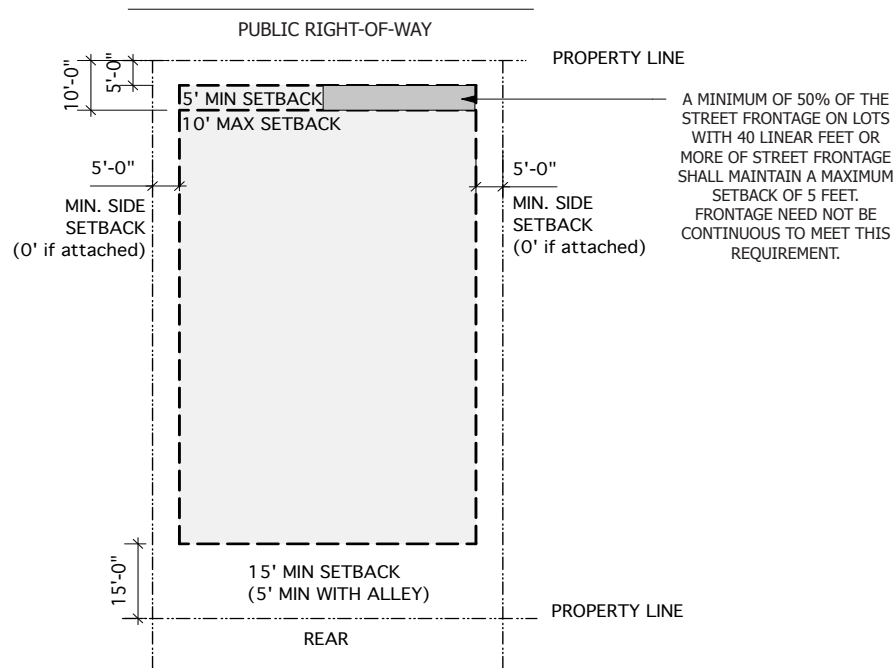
SU-2/VTUR BUILDING PLACEMENT DIAGRAM
